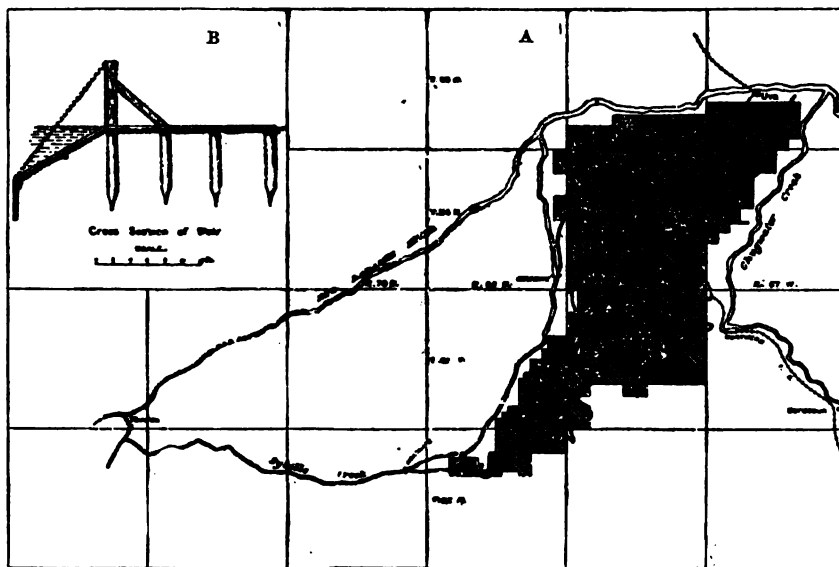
Wyoming Development Company's canal system, A, and cross section of weir, B.
